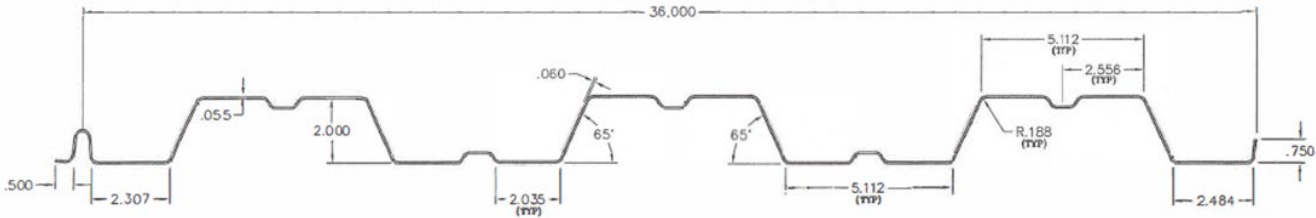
2.0 FLOOR DECK (2 INCH FLOOR DECK)
